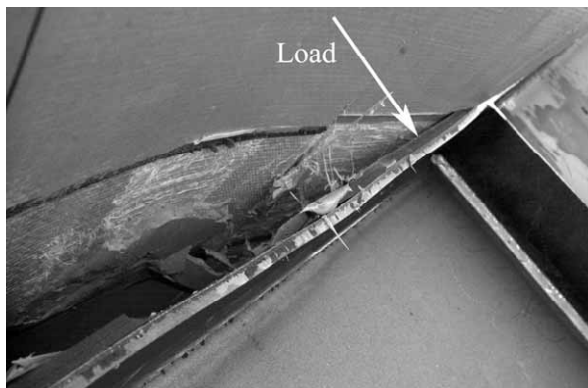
Detachment of the FRP deck from the steel girder after initial failure(Gurtler, 2004)
